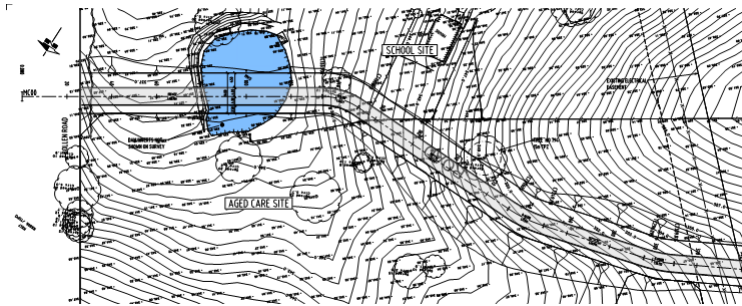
WGA plans (2019) showing proposed road access to Newnham Development
